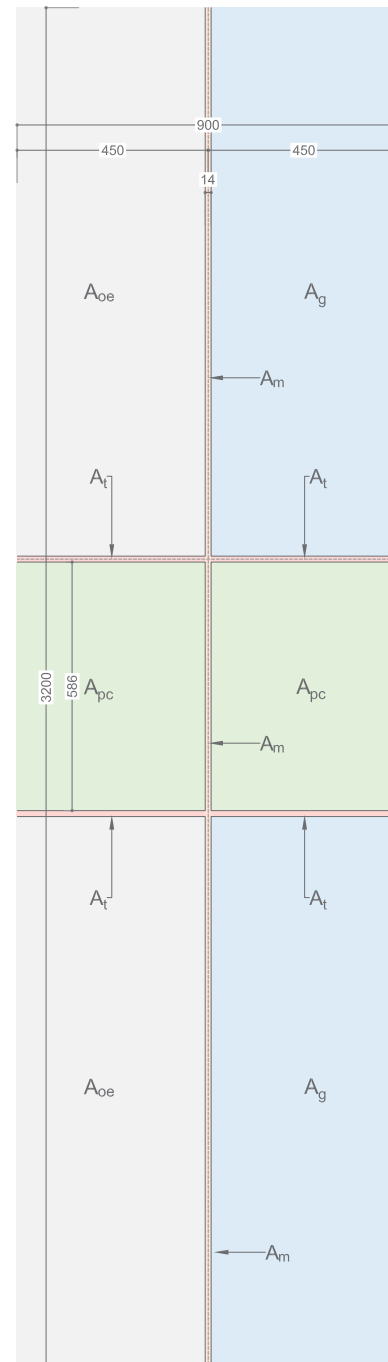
Enlarged elevation view showing surface areas of existing curtain wall for selected case (Source – Author)
